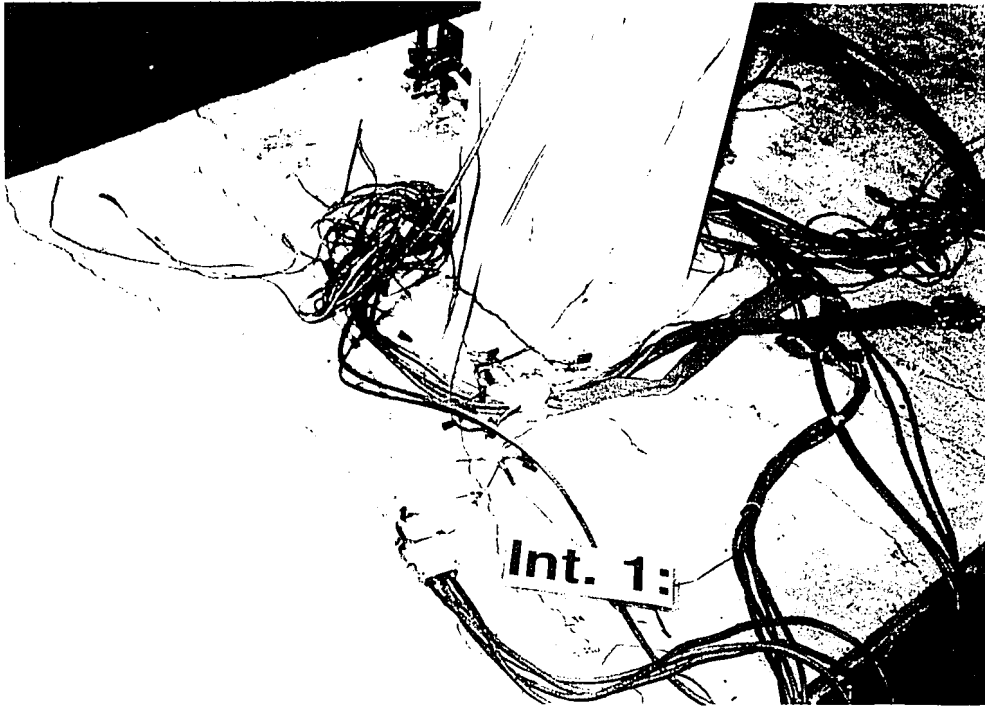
14 Concrete Cracking at Interior Connection 1 at East Peak
